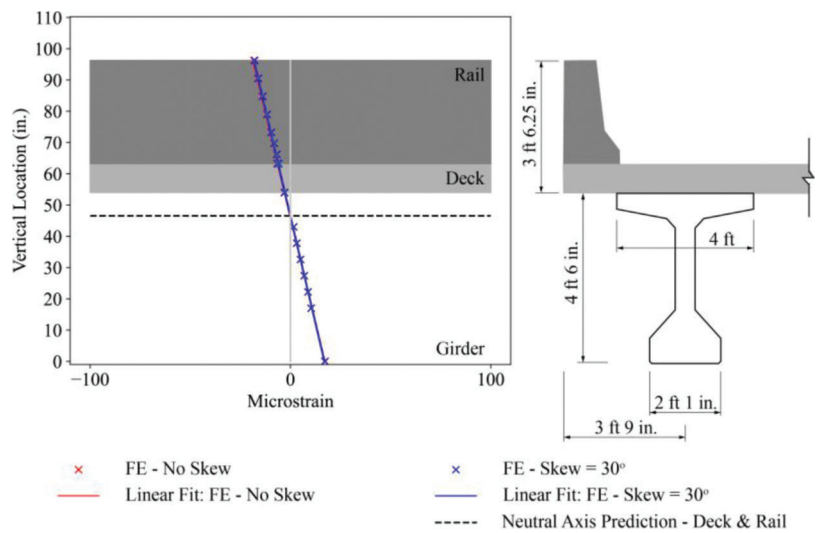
Effect of 30-degree skew angle for three-span continuous prestressed concrete girder bridge with FC rail: FE predictions for strains at peak positive moment location.
